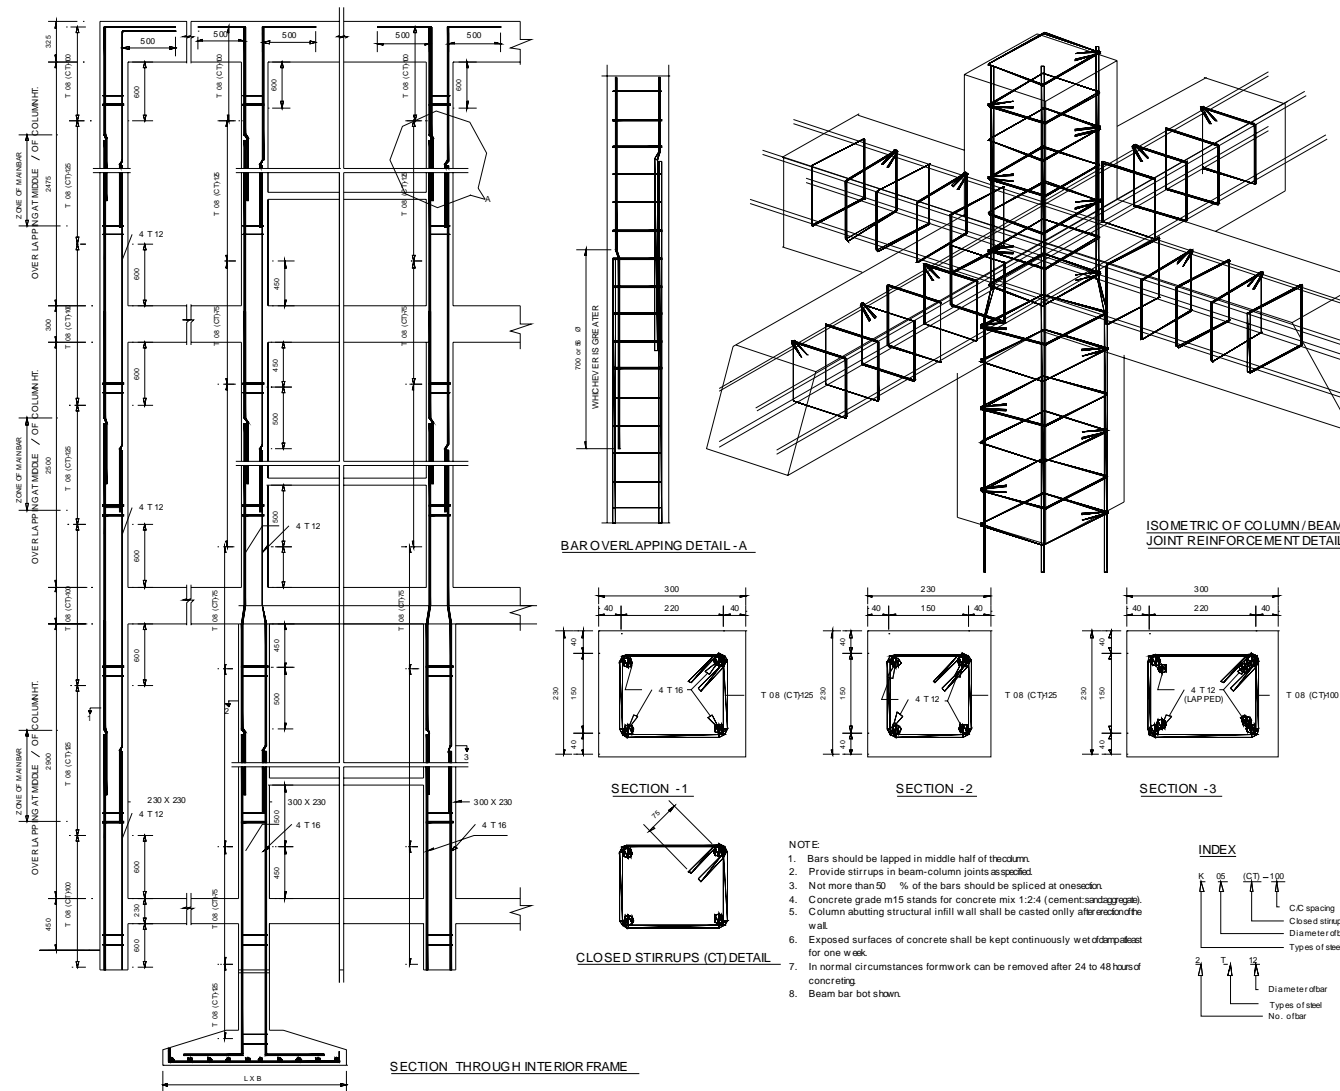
Column Detail (two walls each way / 60 m²)
